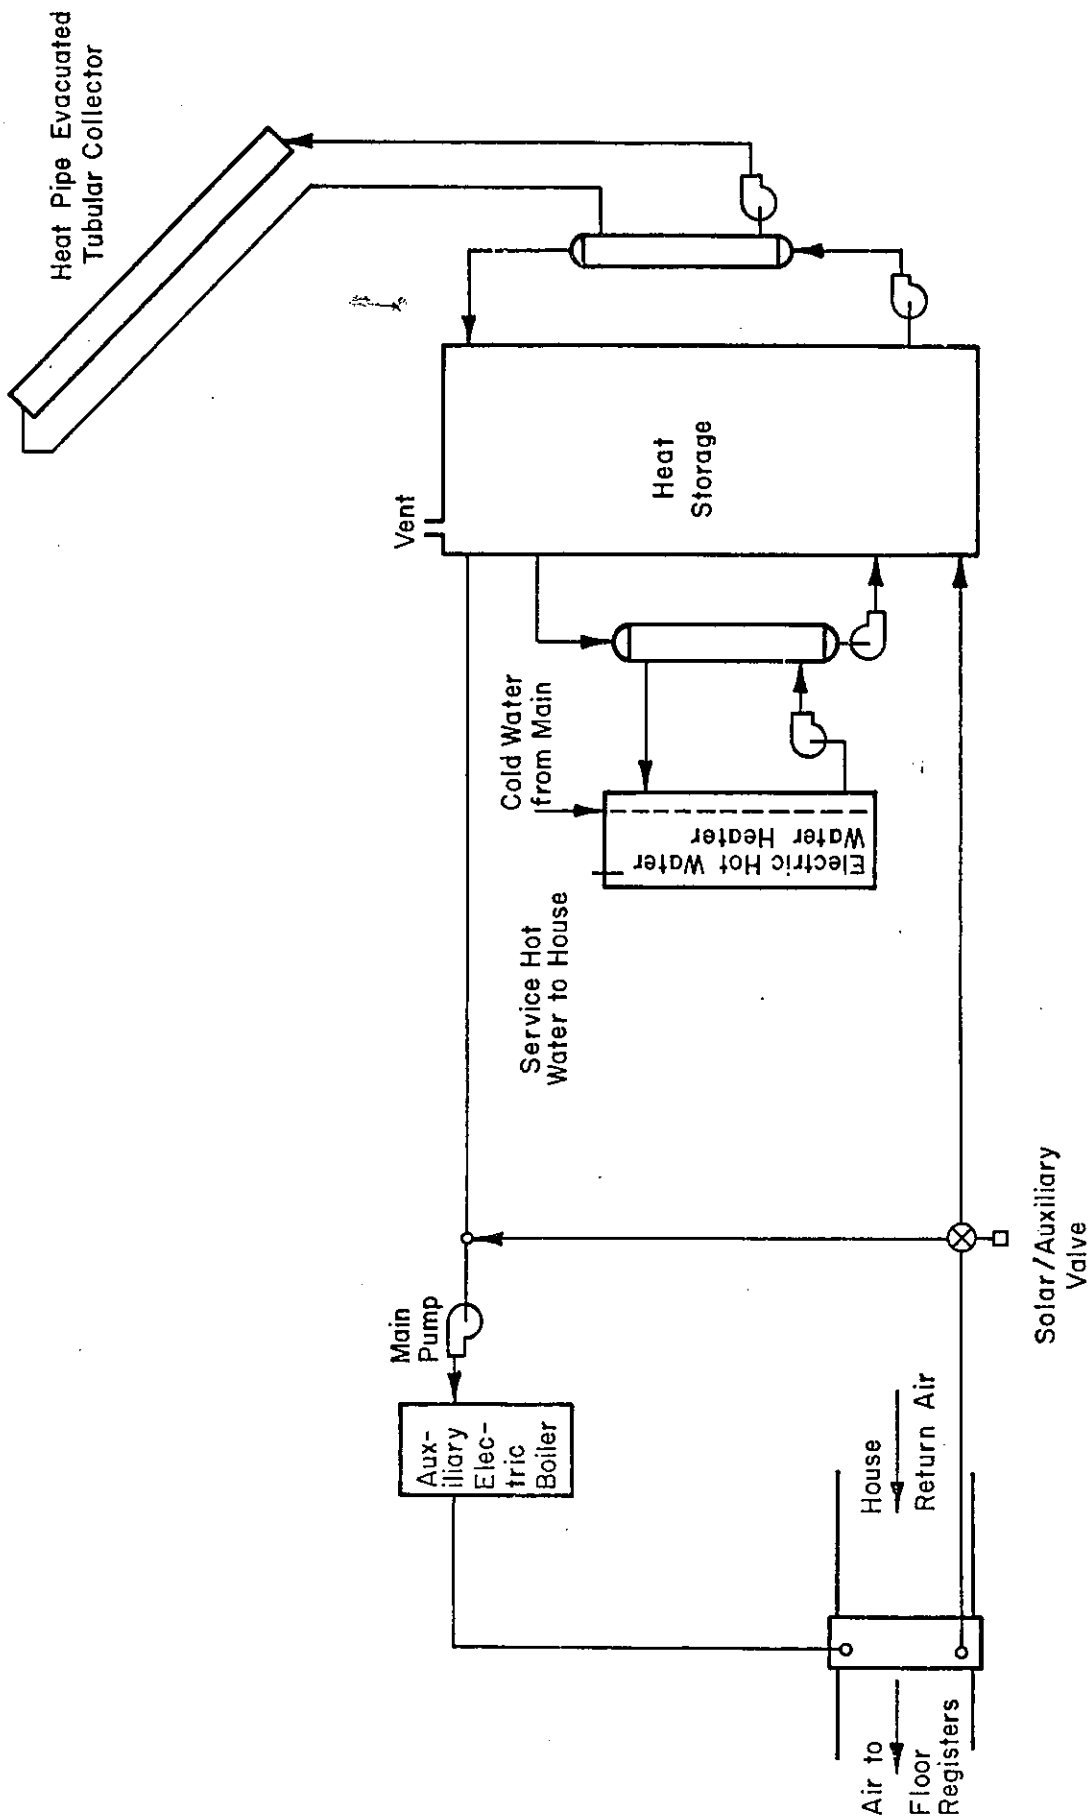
USA-HTG-3, Space Heating with Double Loop Heat Pipe Evacuated Collector, Electric Auxiliary Boiler and External Heat Exchanger Single Tank Hot Water System.
